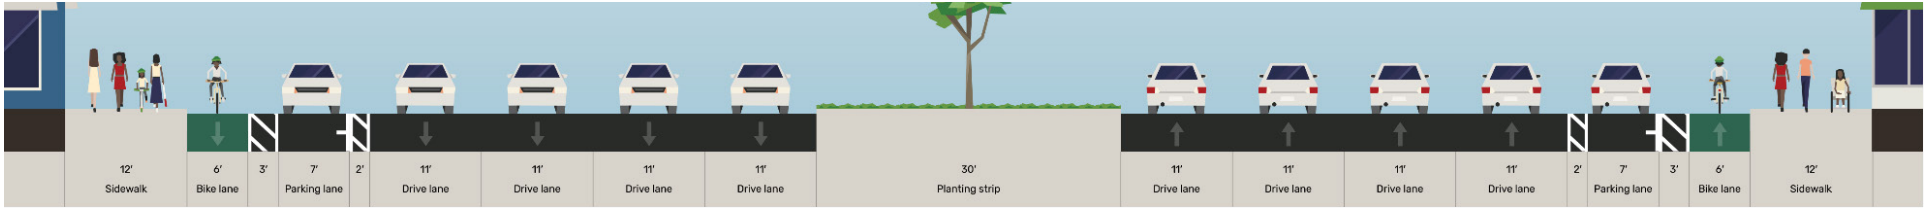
Proposed cross section: Hawthorne Blvd from Imperial Hwy to W 120th St
